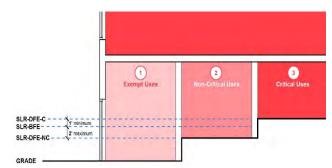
A: CFROZ USE CLASSIFICATIONS AND DESIGN FLOOD ELEVATION
